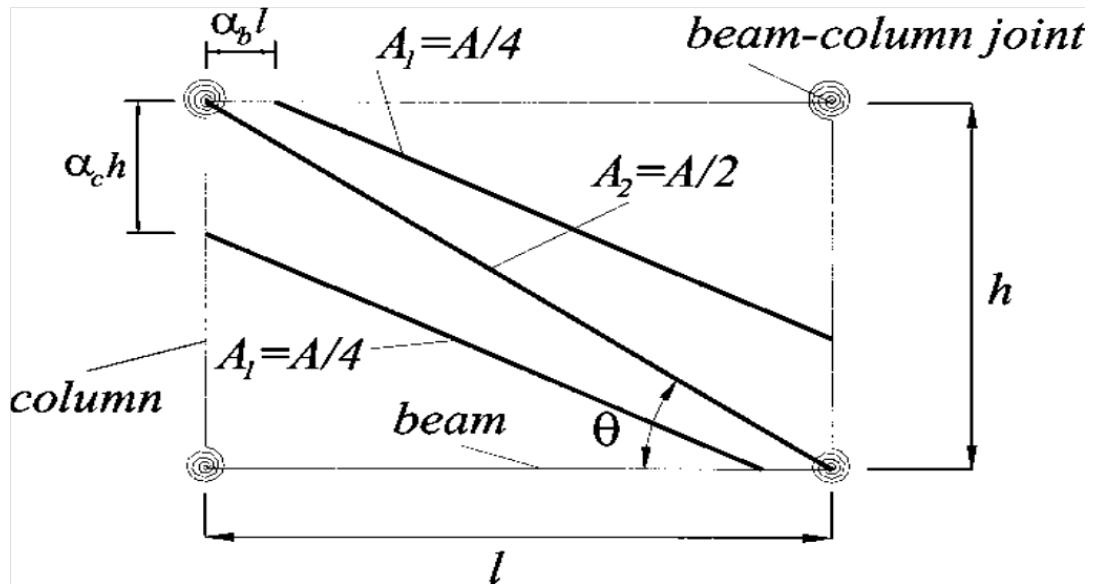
, Proposed concrete masonry-infilled steel frame model, El-Dakhakhni, Wael W at el.(2003)
